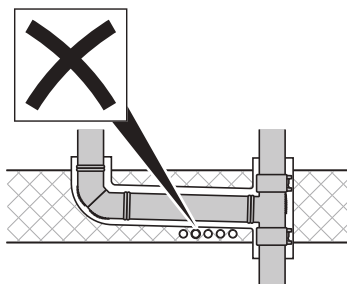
No crossover with water supply lines or electrical installation pipes embedded in concrete
